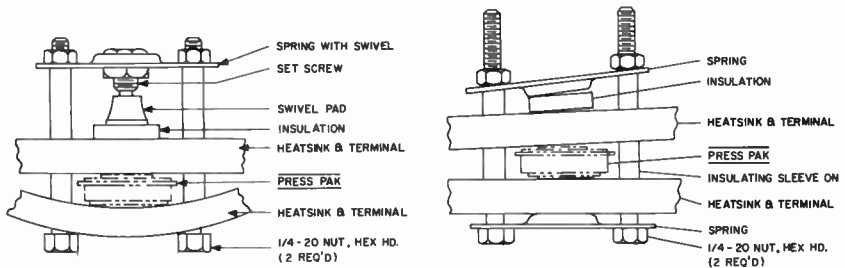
EXAMPLES OF IMPROPER MOUNTING OF PRESS-PAK
